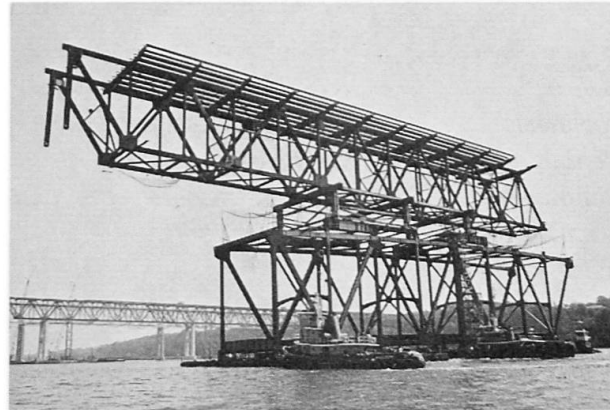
South bridge. Off-site truss erected on barges being moved upstream for final erection in structure
